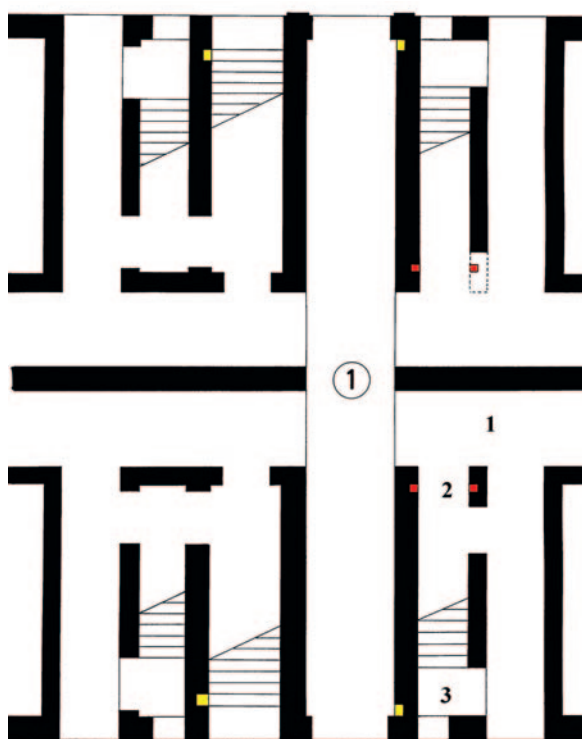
The staircases of the southern apartment block on ground floor level. 1. main entrance corridor; 2. space underneath internal staircase; 3. landing of internal stairs (plan Saskia Stevens).
